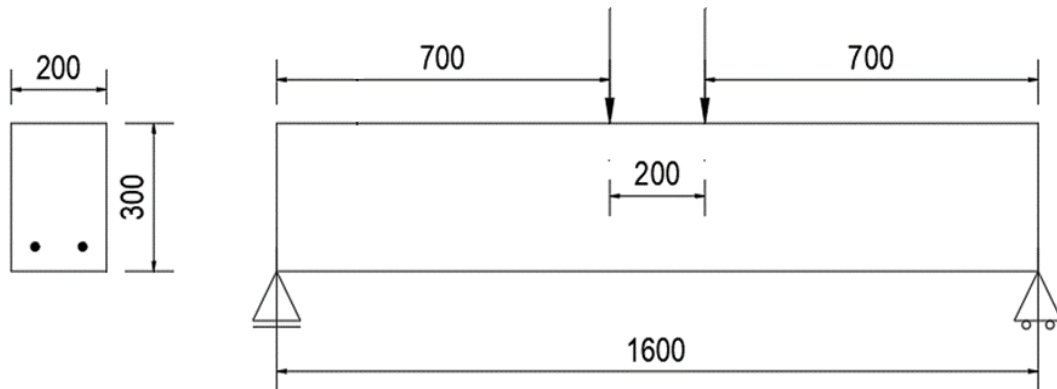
The beam model used for modelling Takahashi et al. (1997) (all dimensions are in mm)
